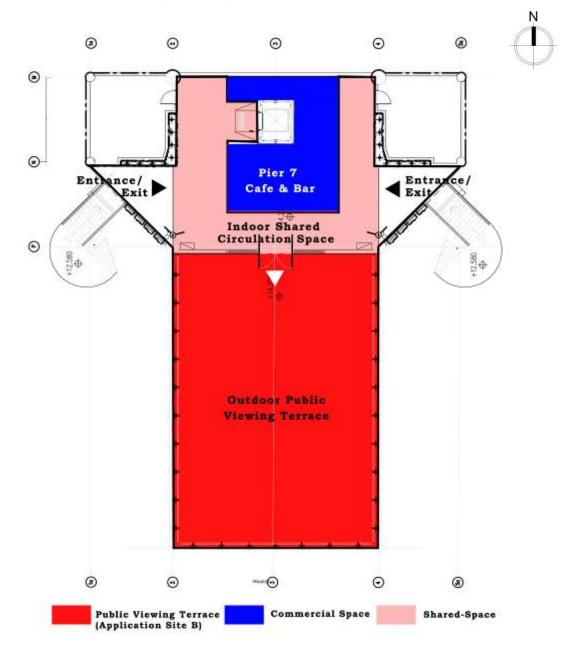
Existing Floor Plan of Pier 7 Café & Bar, Application Site B.
